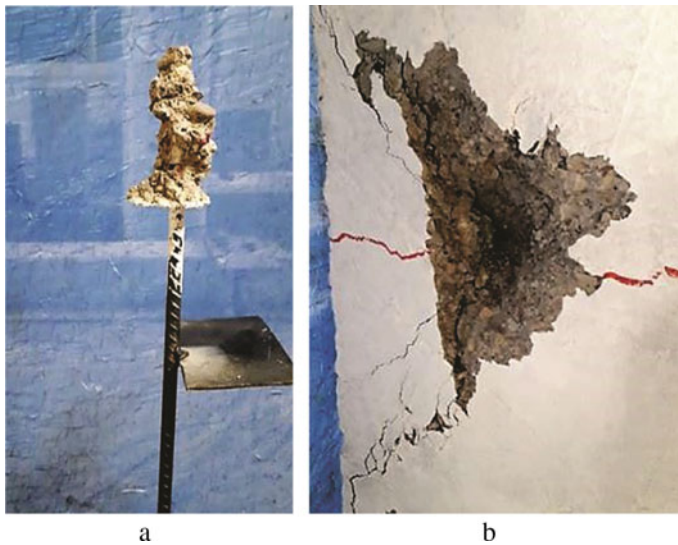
a Pulled-out anchor and b conical failure of concrete
